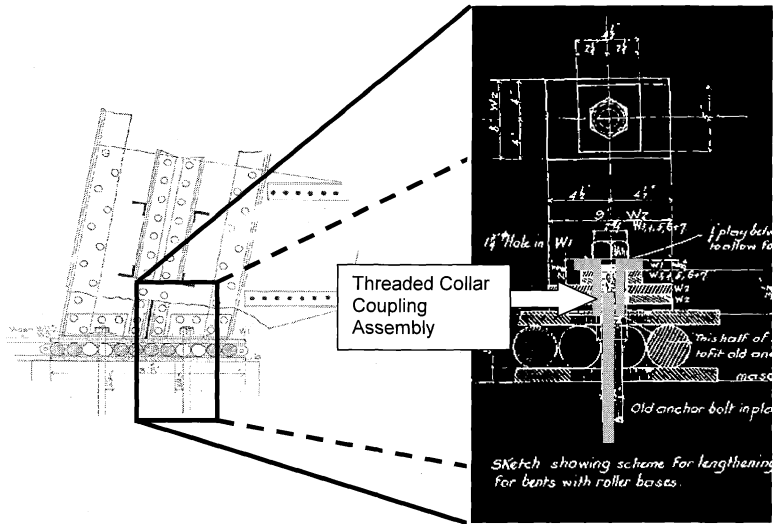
Wrought Iron Anchor Bolt Extension via Threaded Collar Coupling Assembly
